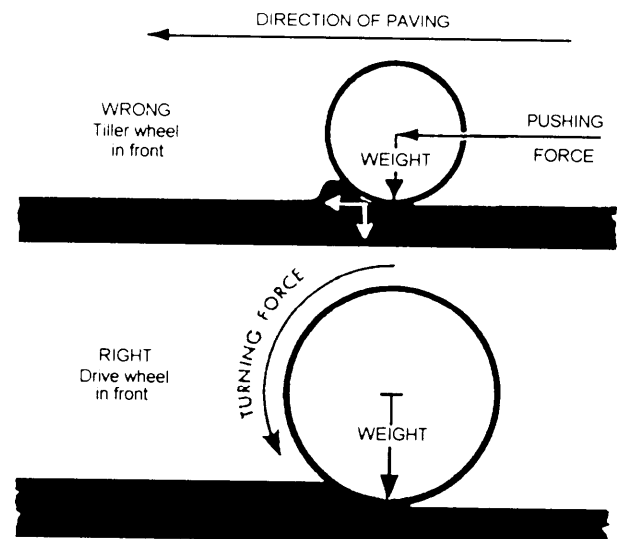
Forces acting when tiller wheel or drive wheel is forward.
